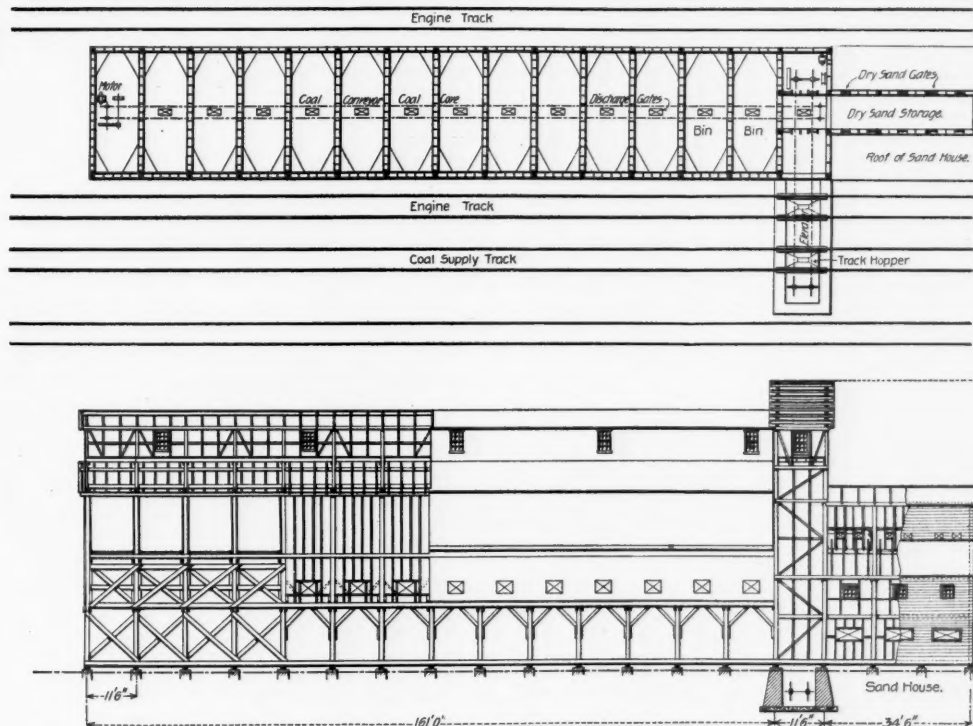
Framing of Erie Coaling Station, with Plan of Horizontal Coal Conveyor Room at Top of Building.
